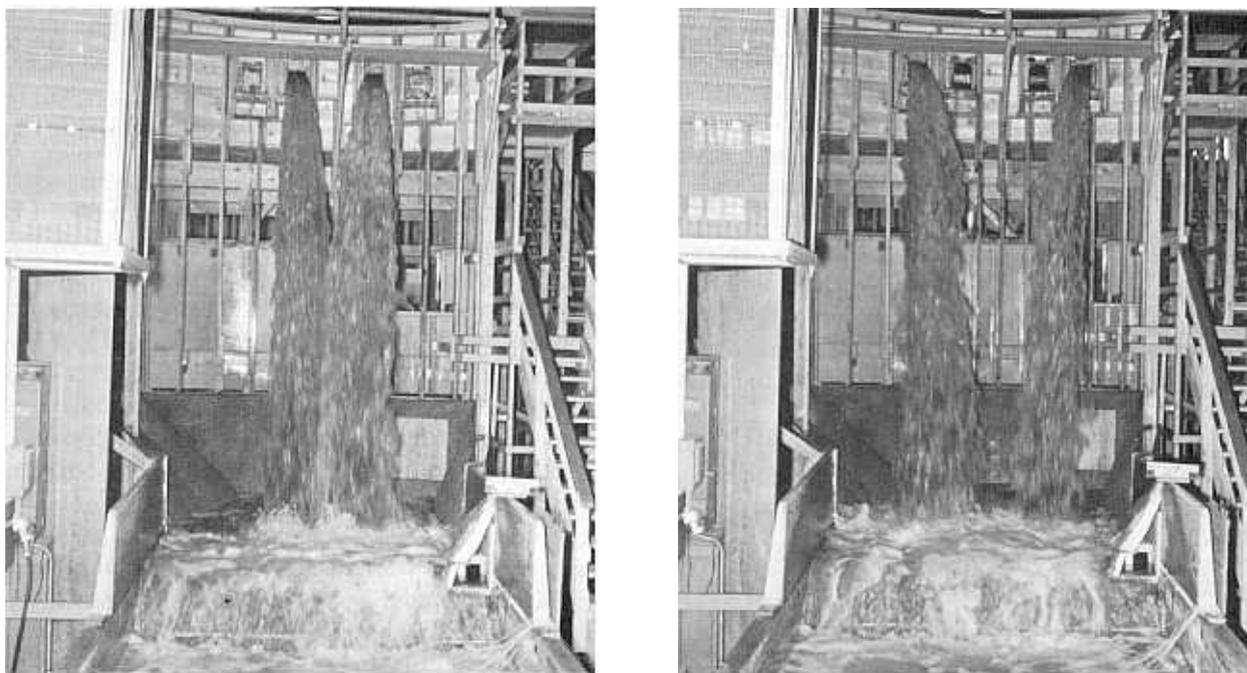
Test on spillway with horizontal conduits of the alternate design. Reservoir elevation 7160. Left view: inside gates fully open. Right view: outside gates fully open (approximate  $Q=20,000$  cubic feet per second in each view).
